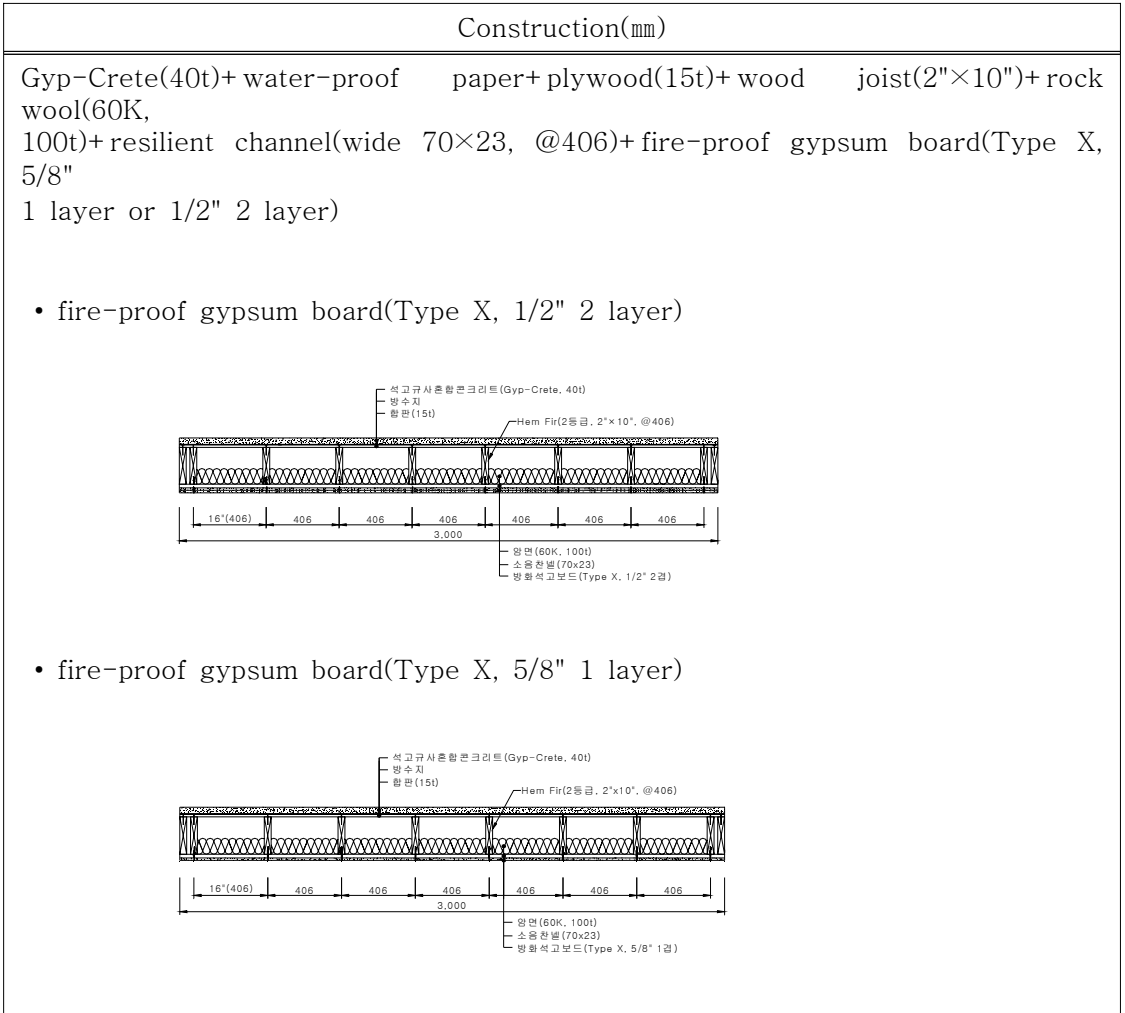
Specification of floor of light-frame wood structure by American softwood structural lumber
